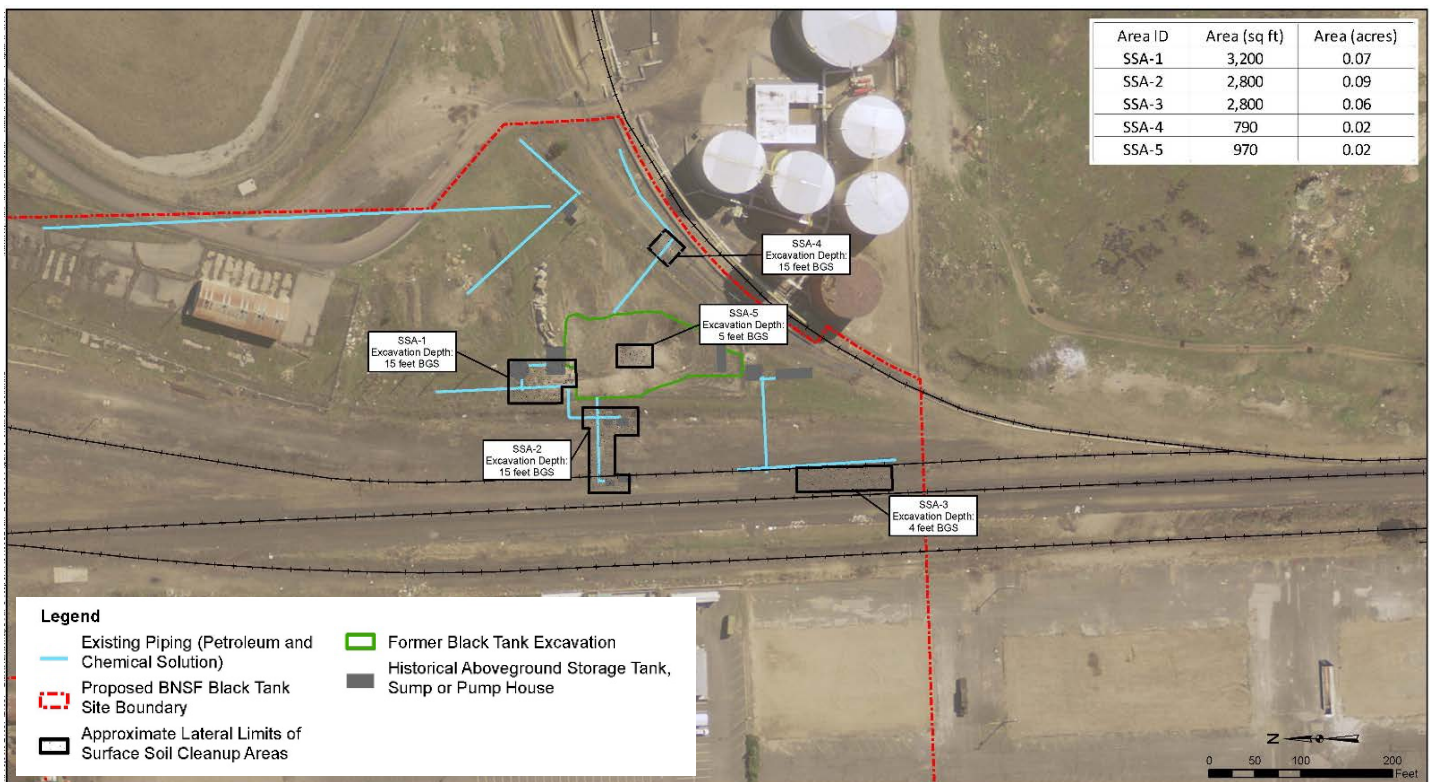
Site diagram showing the contaminated shallow soil zones to be excavated. *Courtesy of ERM.
